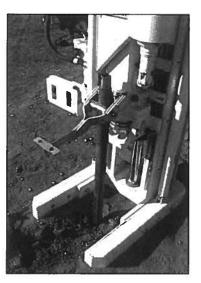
Outer casing may be retrieved with a pull cap or rod grip pull system if the probe hole is sealed with granular bentonite.
